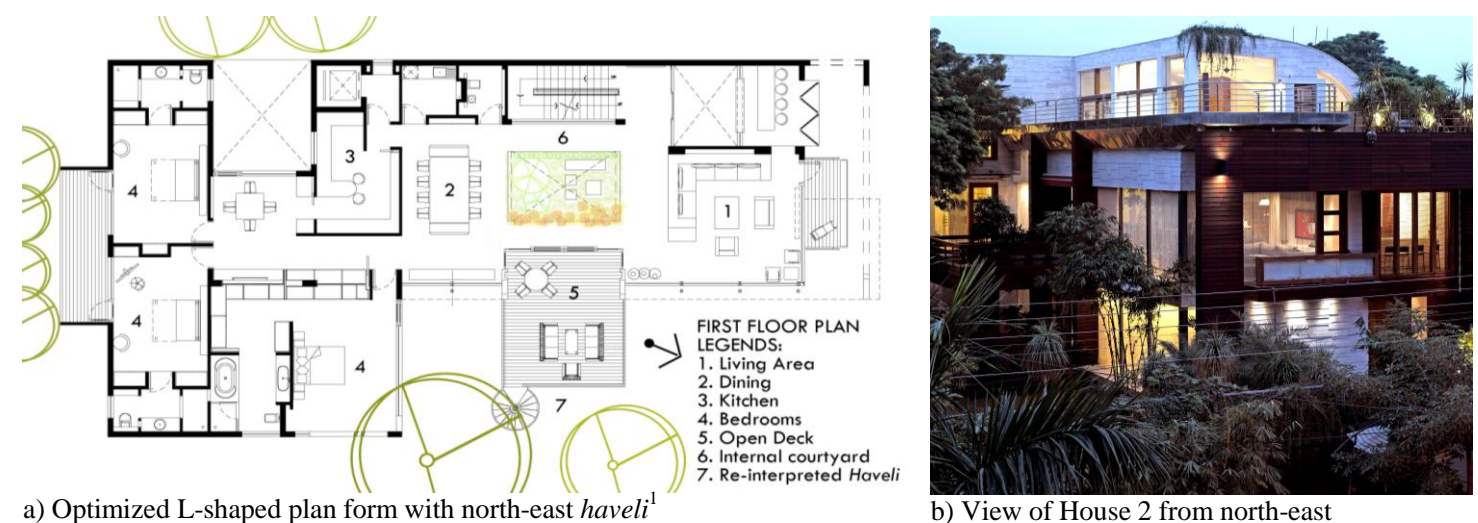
(a) Building plan form with re-interpreted *haveli*¹ for heat sink, shade, and airflow, (b) Build envelope with wood and limestone cladding and landscape trees. Images: Courtesy of Morphogenesis (architects).
